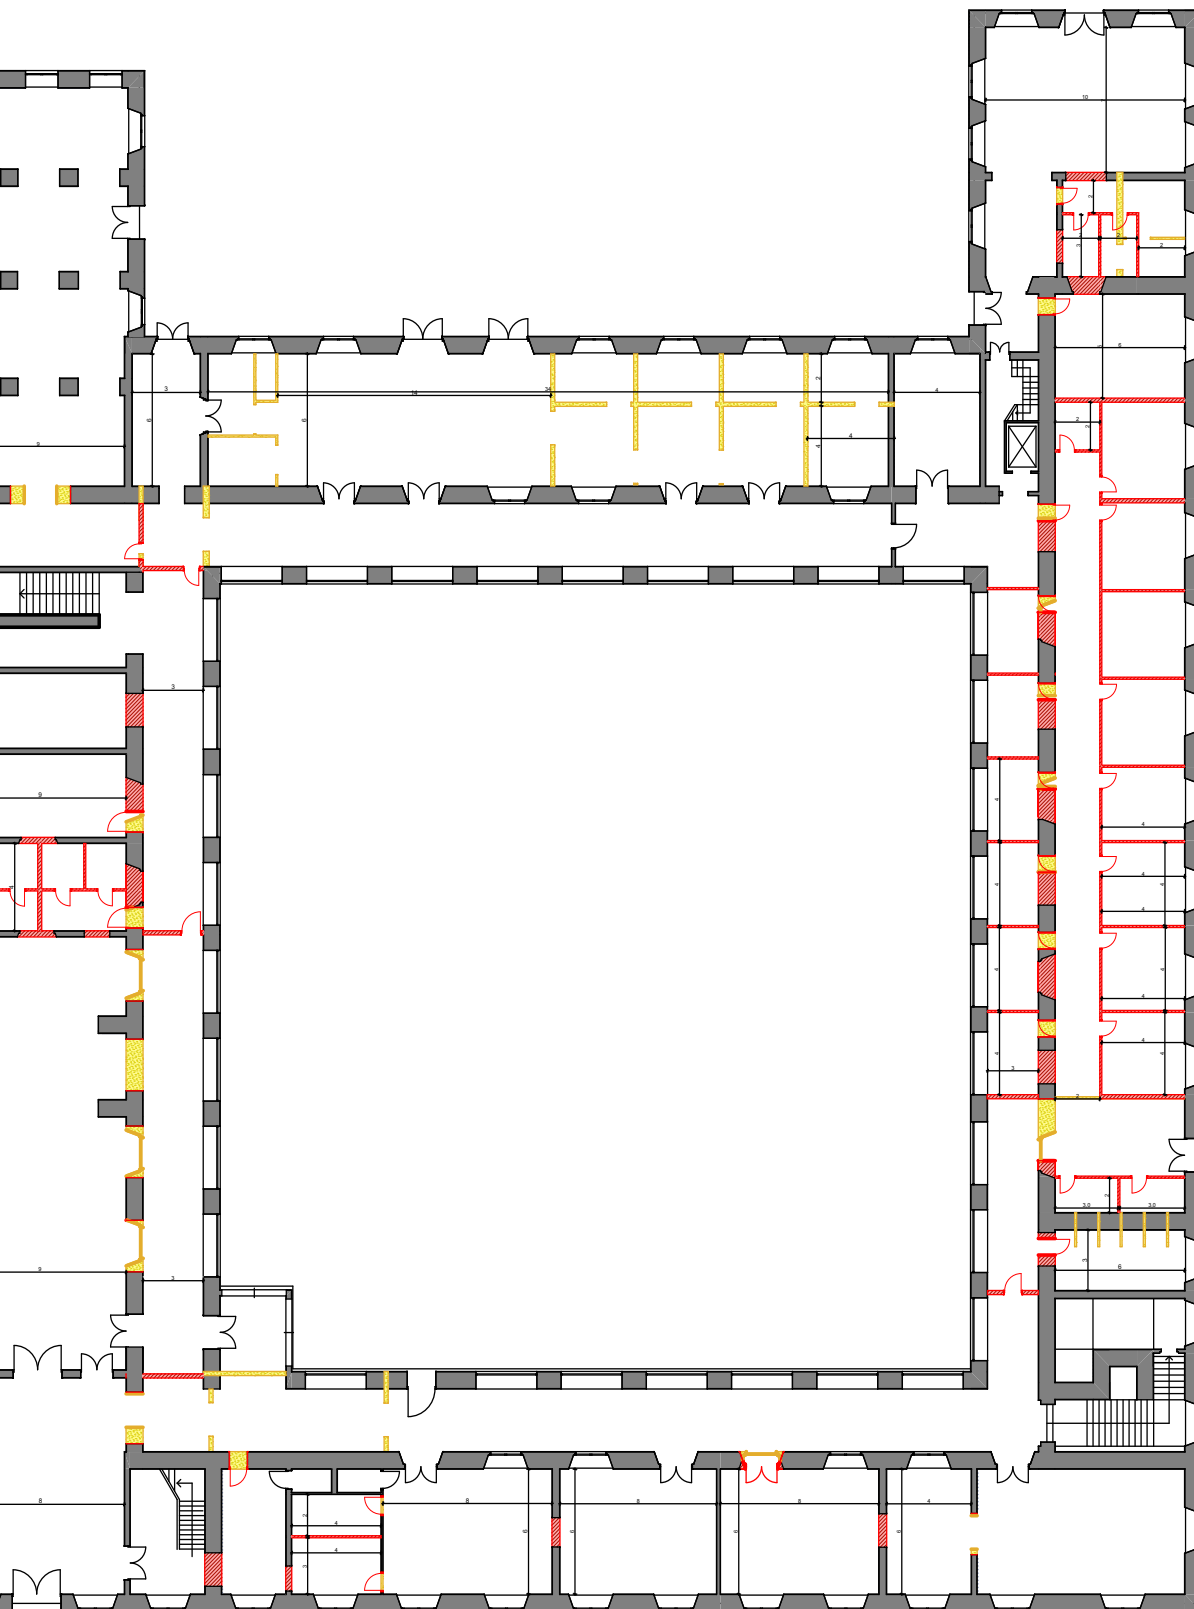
Ground floor plan of the Chiarugi Pavilion demolition and construction.
